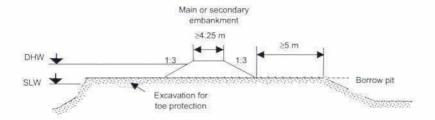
Typical cross-section of a borrow pit for construction of the main embankment
